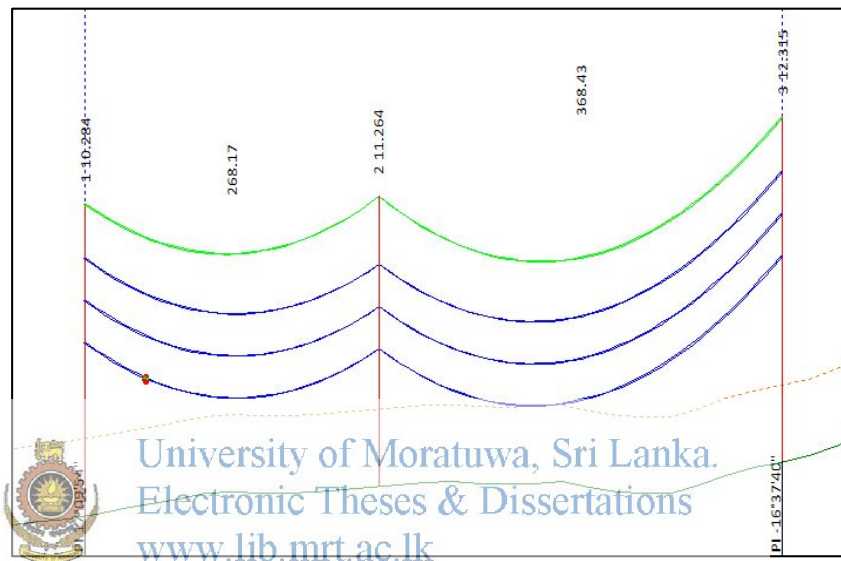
Profile view of the section with new tensioned Lynx Conductor
